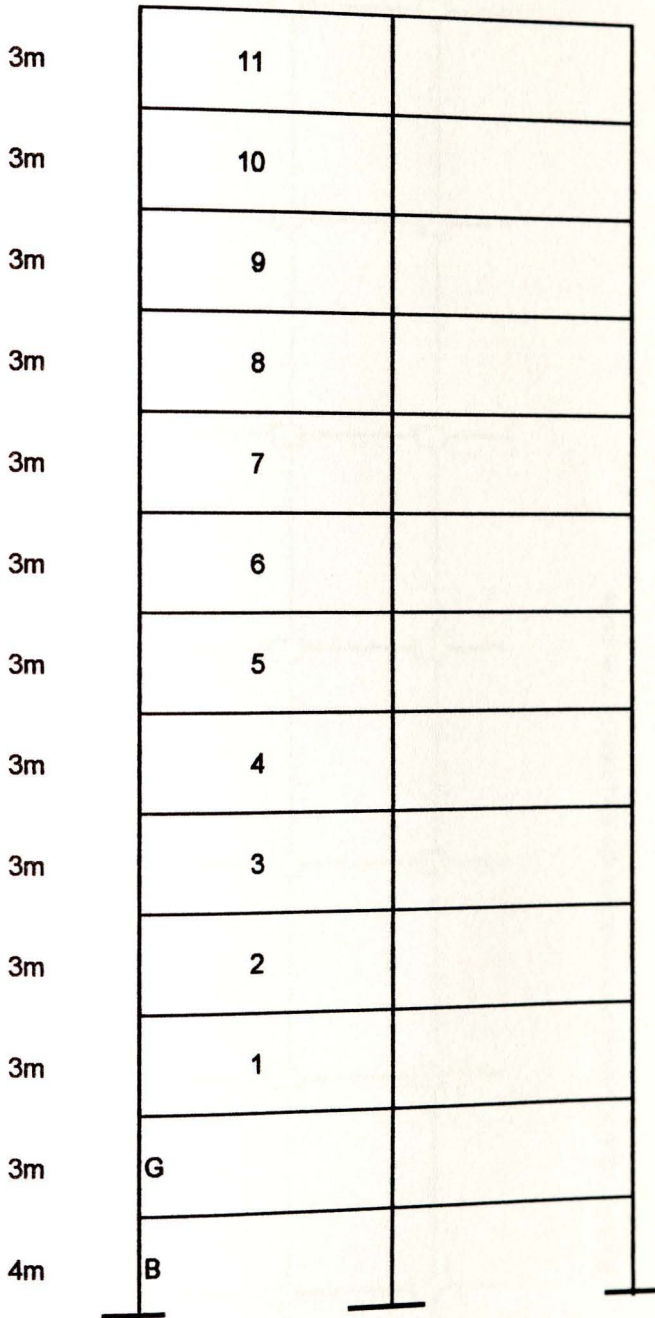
ETHIOPIAN TRADE UNION BUILDING ELEVATION.
